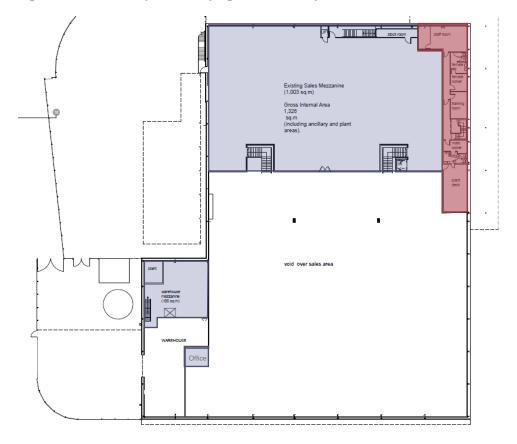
First floor plan mezzanines (red: concrete with metal decking; purple: cold-formed joists with OSB)
